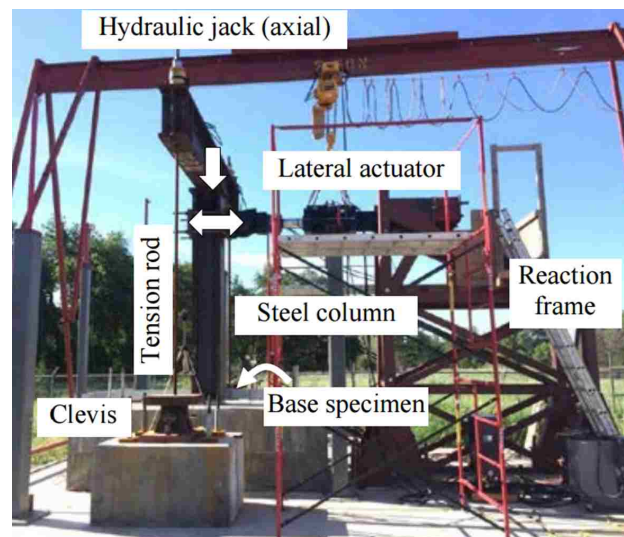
Test Setup for ECB Connection Specimen (Grilli & Kanvinde)
